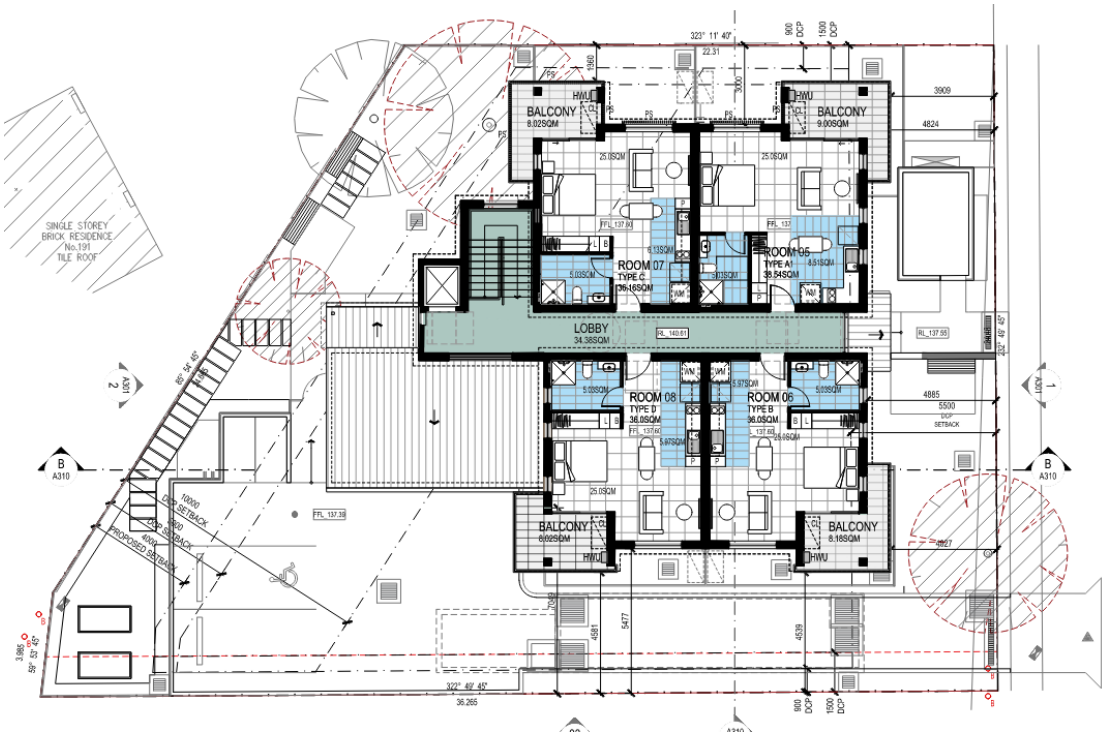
Extract from Architectural Plans – General Arrangement Plan – First Level (Source: Architectural Plans, Mode Design, dated 22/07/2022)
